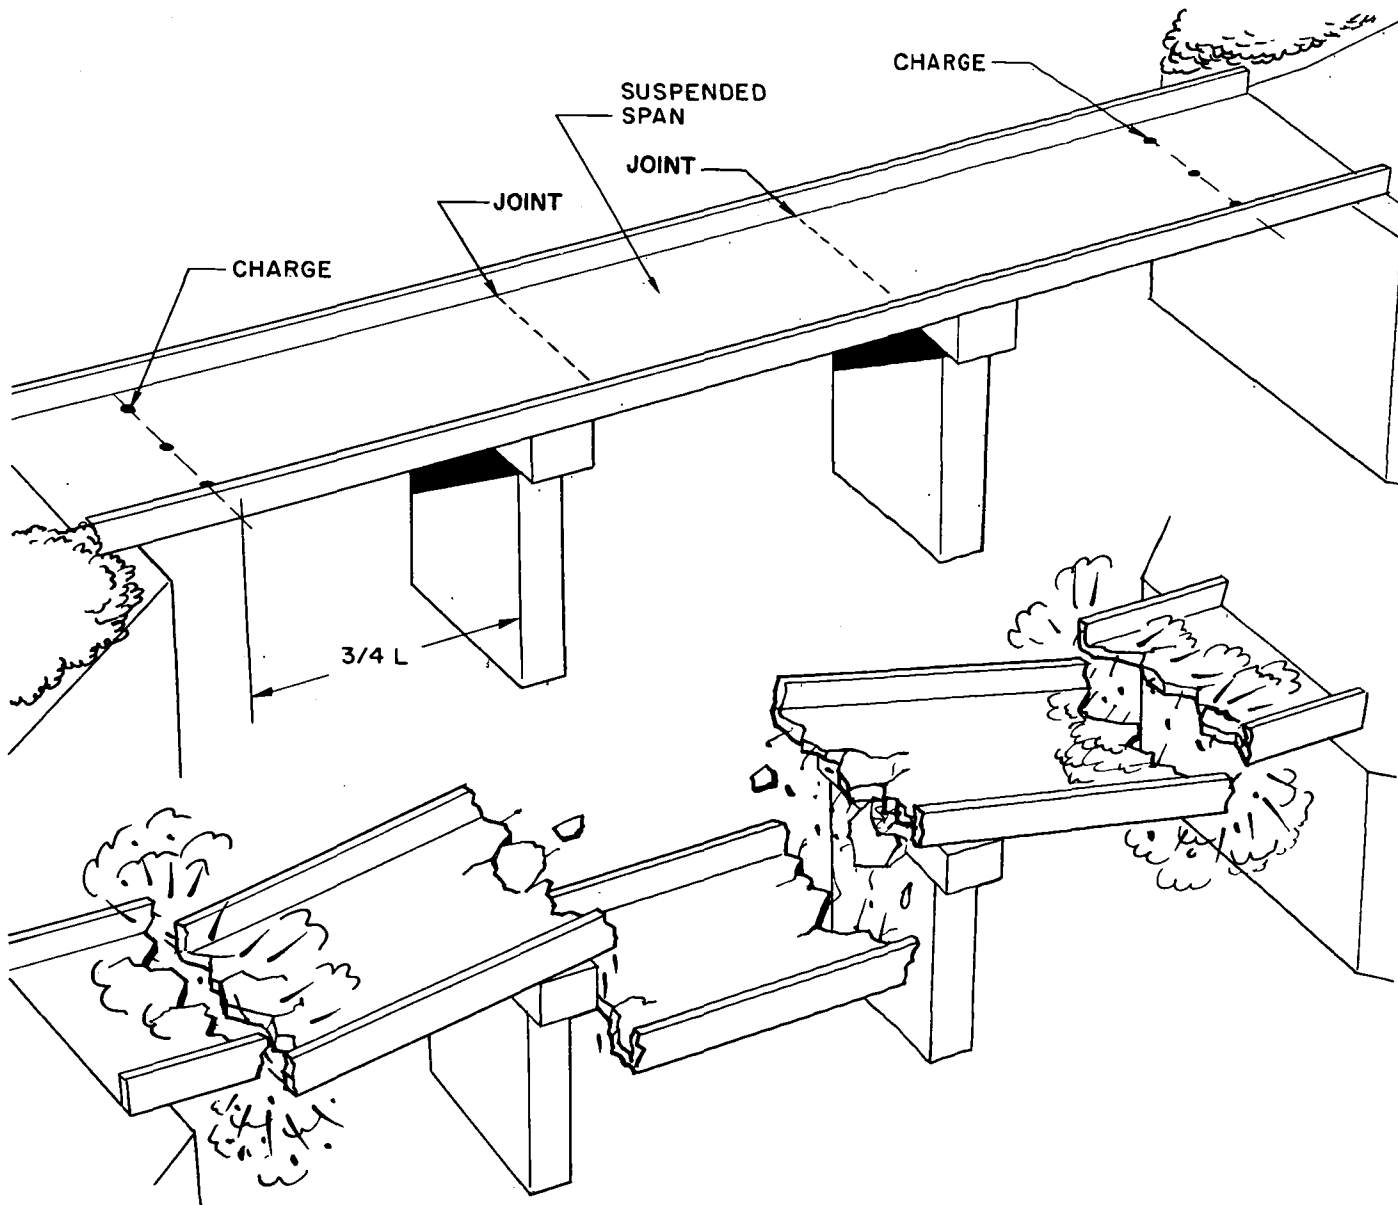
Complete destruction of concrete slab cantilever bridge with suspended span.
